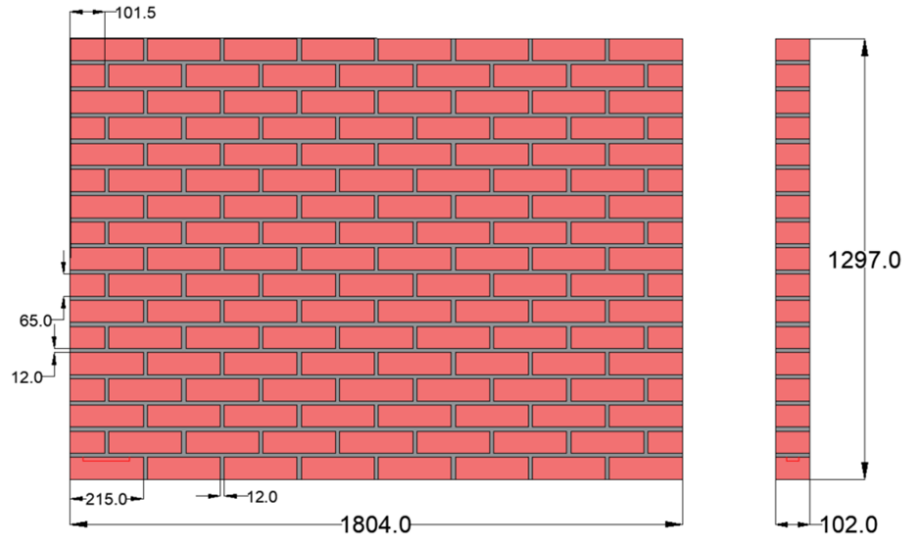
Dimensions (mm) of the walls subjected to in-plane vertical loads.
